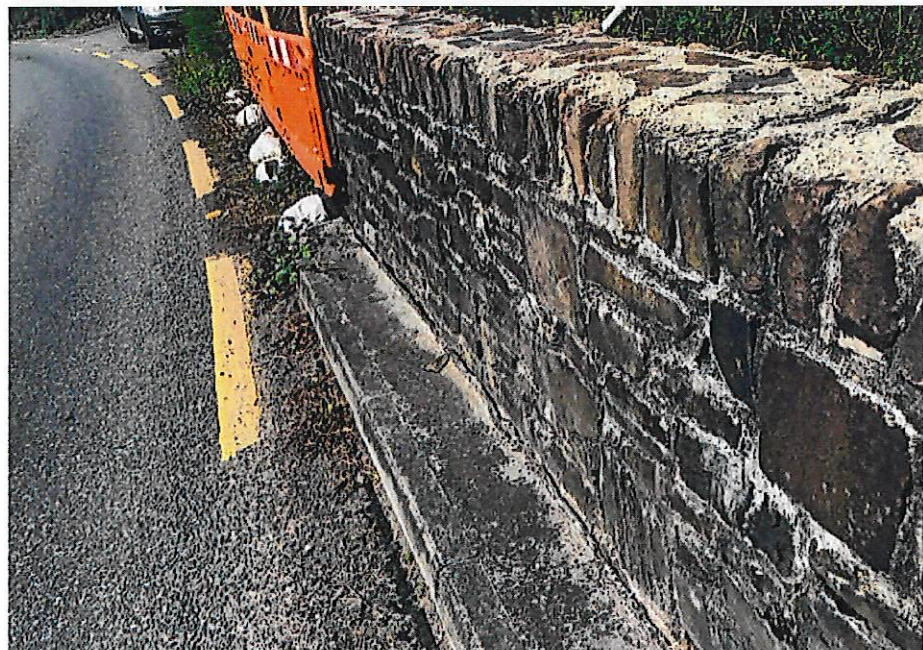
Damage to parapet wall on northern side of the N70.
